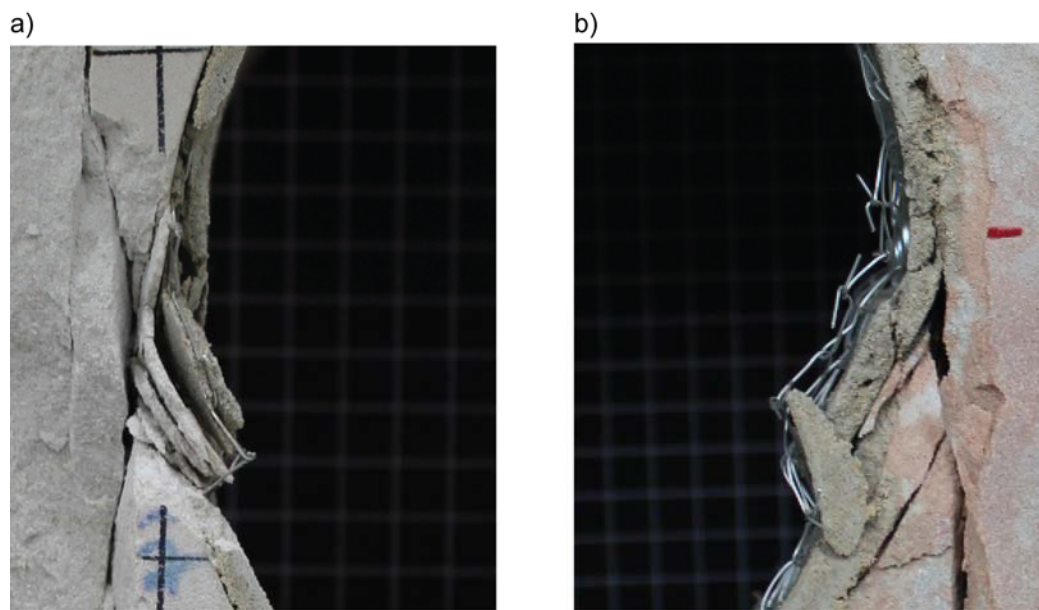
Tunnel surface after failure a) mesh reinforced (Specimen No.8) b) mesh exposed (Specimen No.11).
